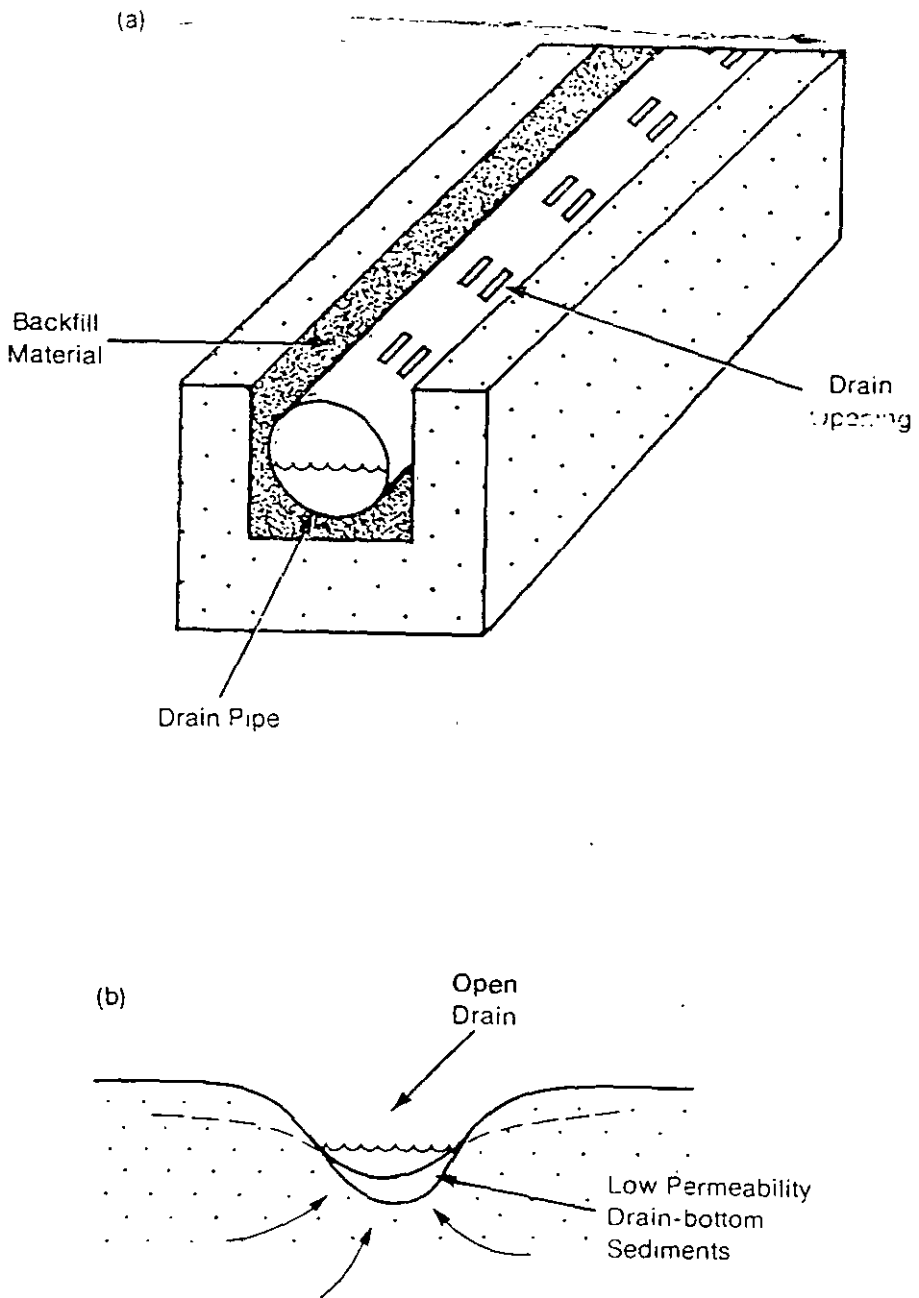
Factors affecting head loss immediately around a drain: (a) buried drain pipe in backfilled ditch and (b) open drain.
